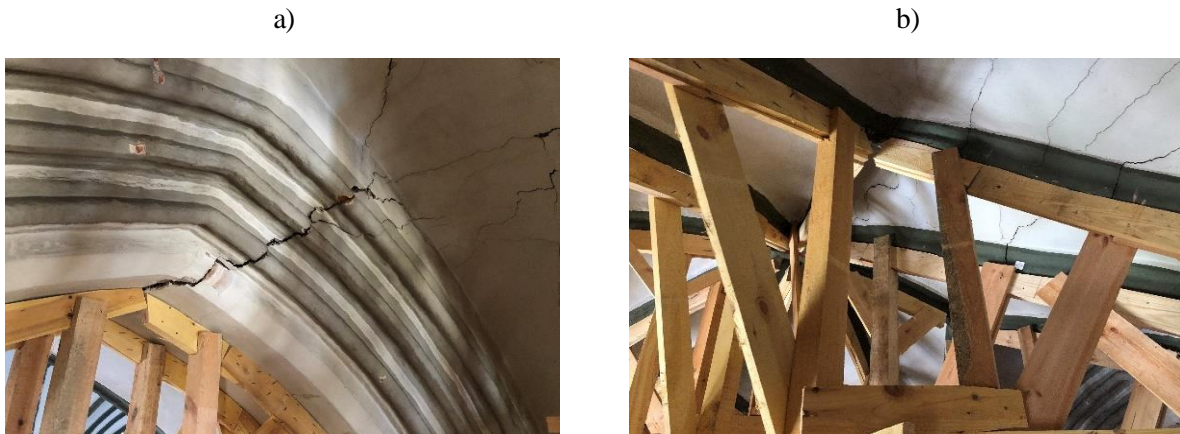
Scaffolding stabilizing the vaults of the southern aisle of the Basilica of St. St. Mikołaja in Gdańsk: a) an arch between pillars no. 2 and no. 3, b) supported ribs of the vaults (*photo by T. Majewski*)
